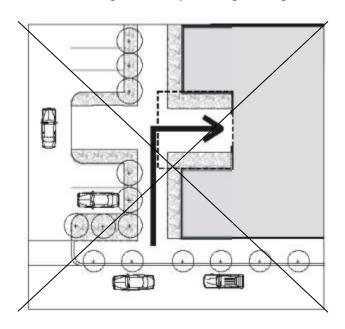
(B): Example of connection of building entrance which is not located on a street but has a clear pedestrian walkway to it.
